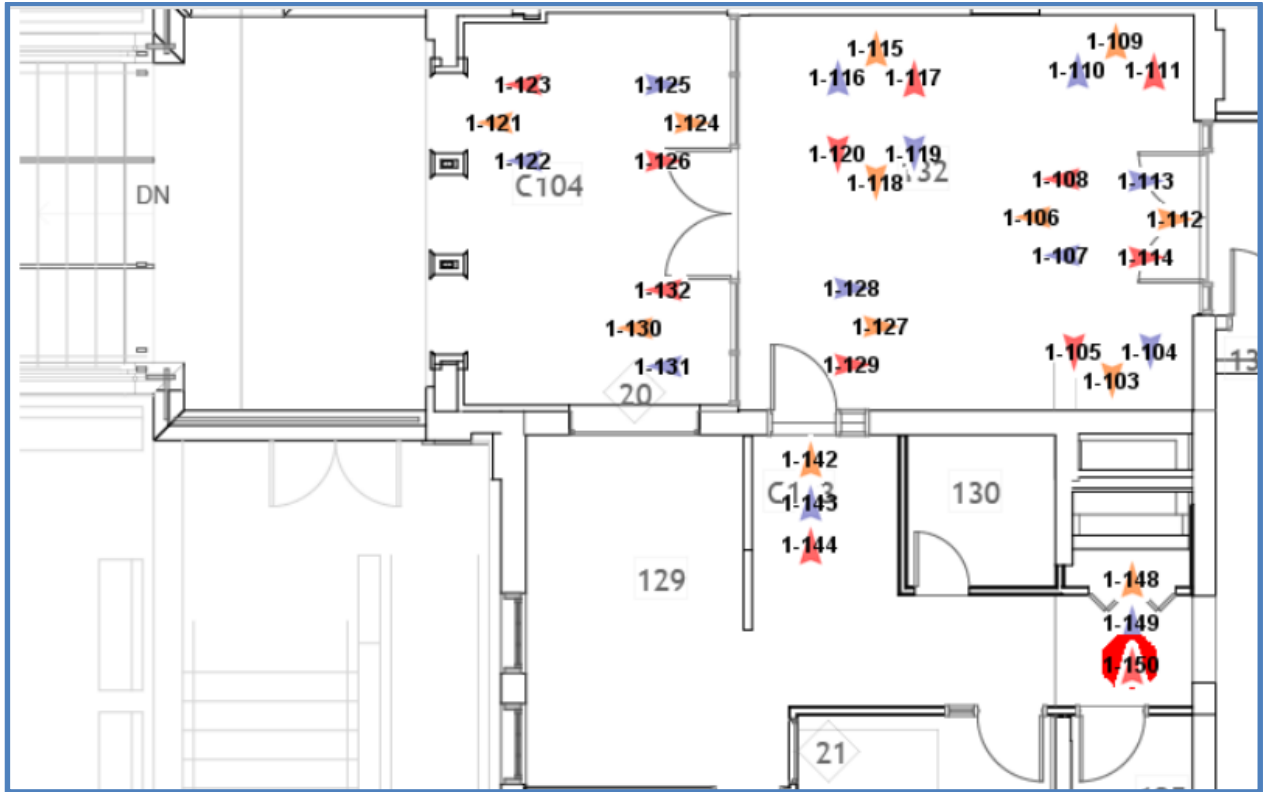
Enlarged view of floor plan showing photo indicators. (Multivista®)
